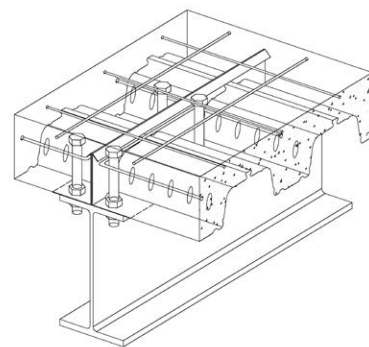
Demountable system, featuring shear studs bolted to the flange of a beam
